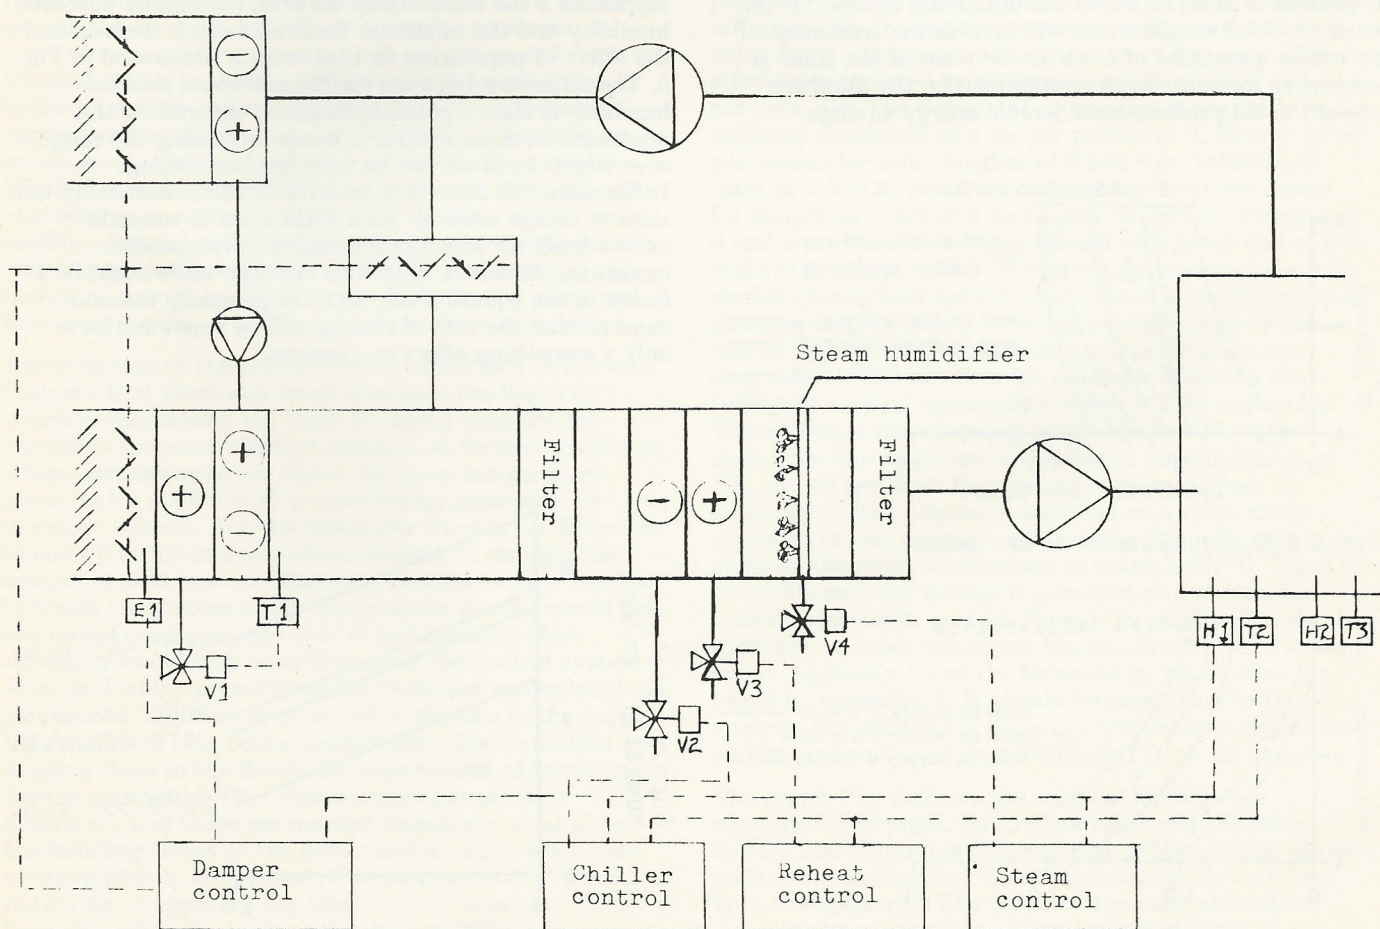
Simple layout of an air conditioning plant serving one zone.
